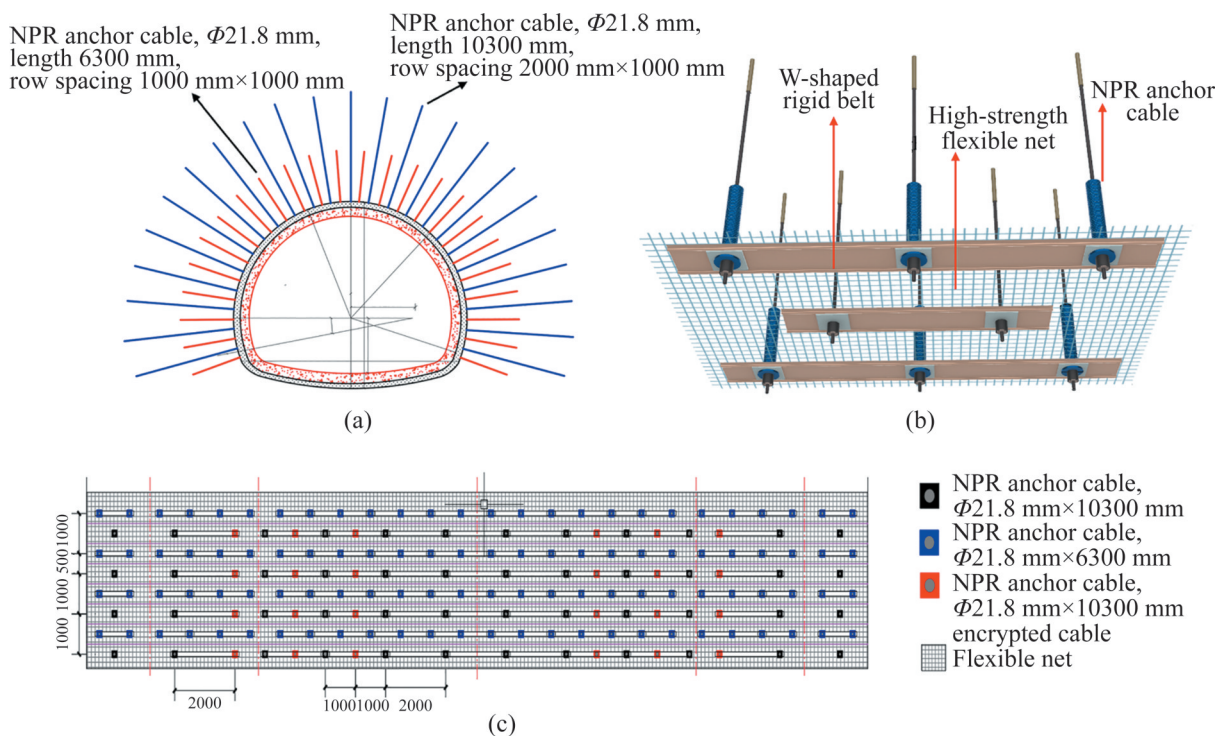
Design of NPR anchor cable in Daliangshan Tunnel: (a) NPR anchor cable support design; (b) NPR anchor cable support system; (c) Tunnel annular arrangement of the NPR anchor cable (unit: mm)
